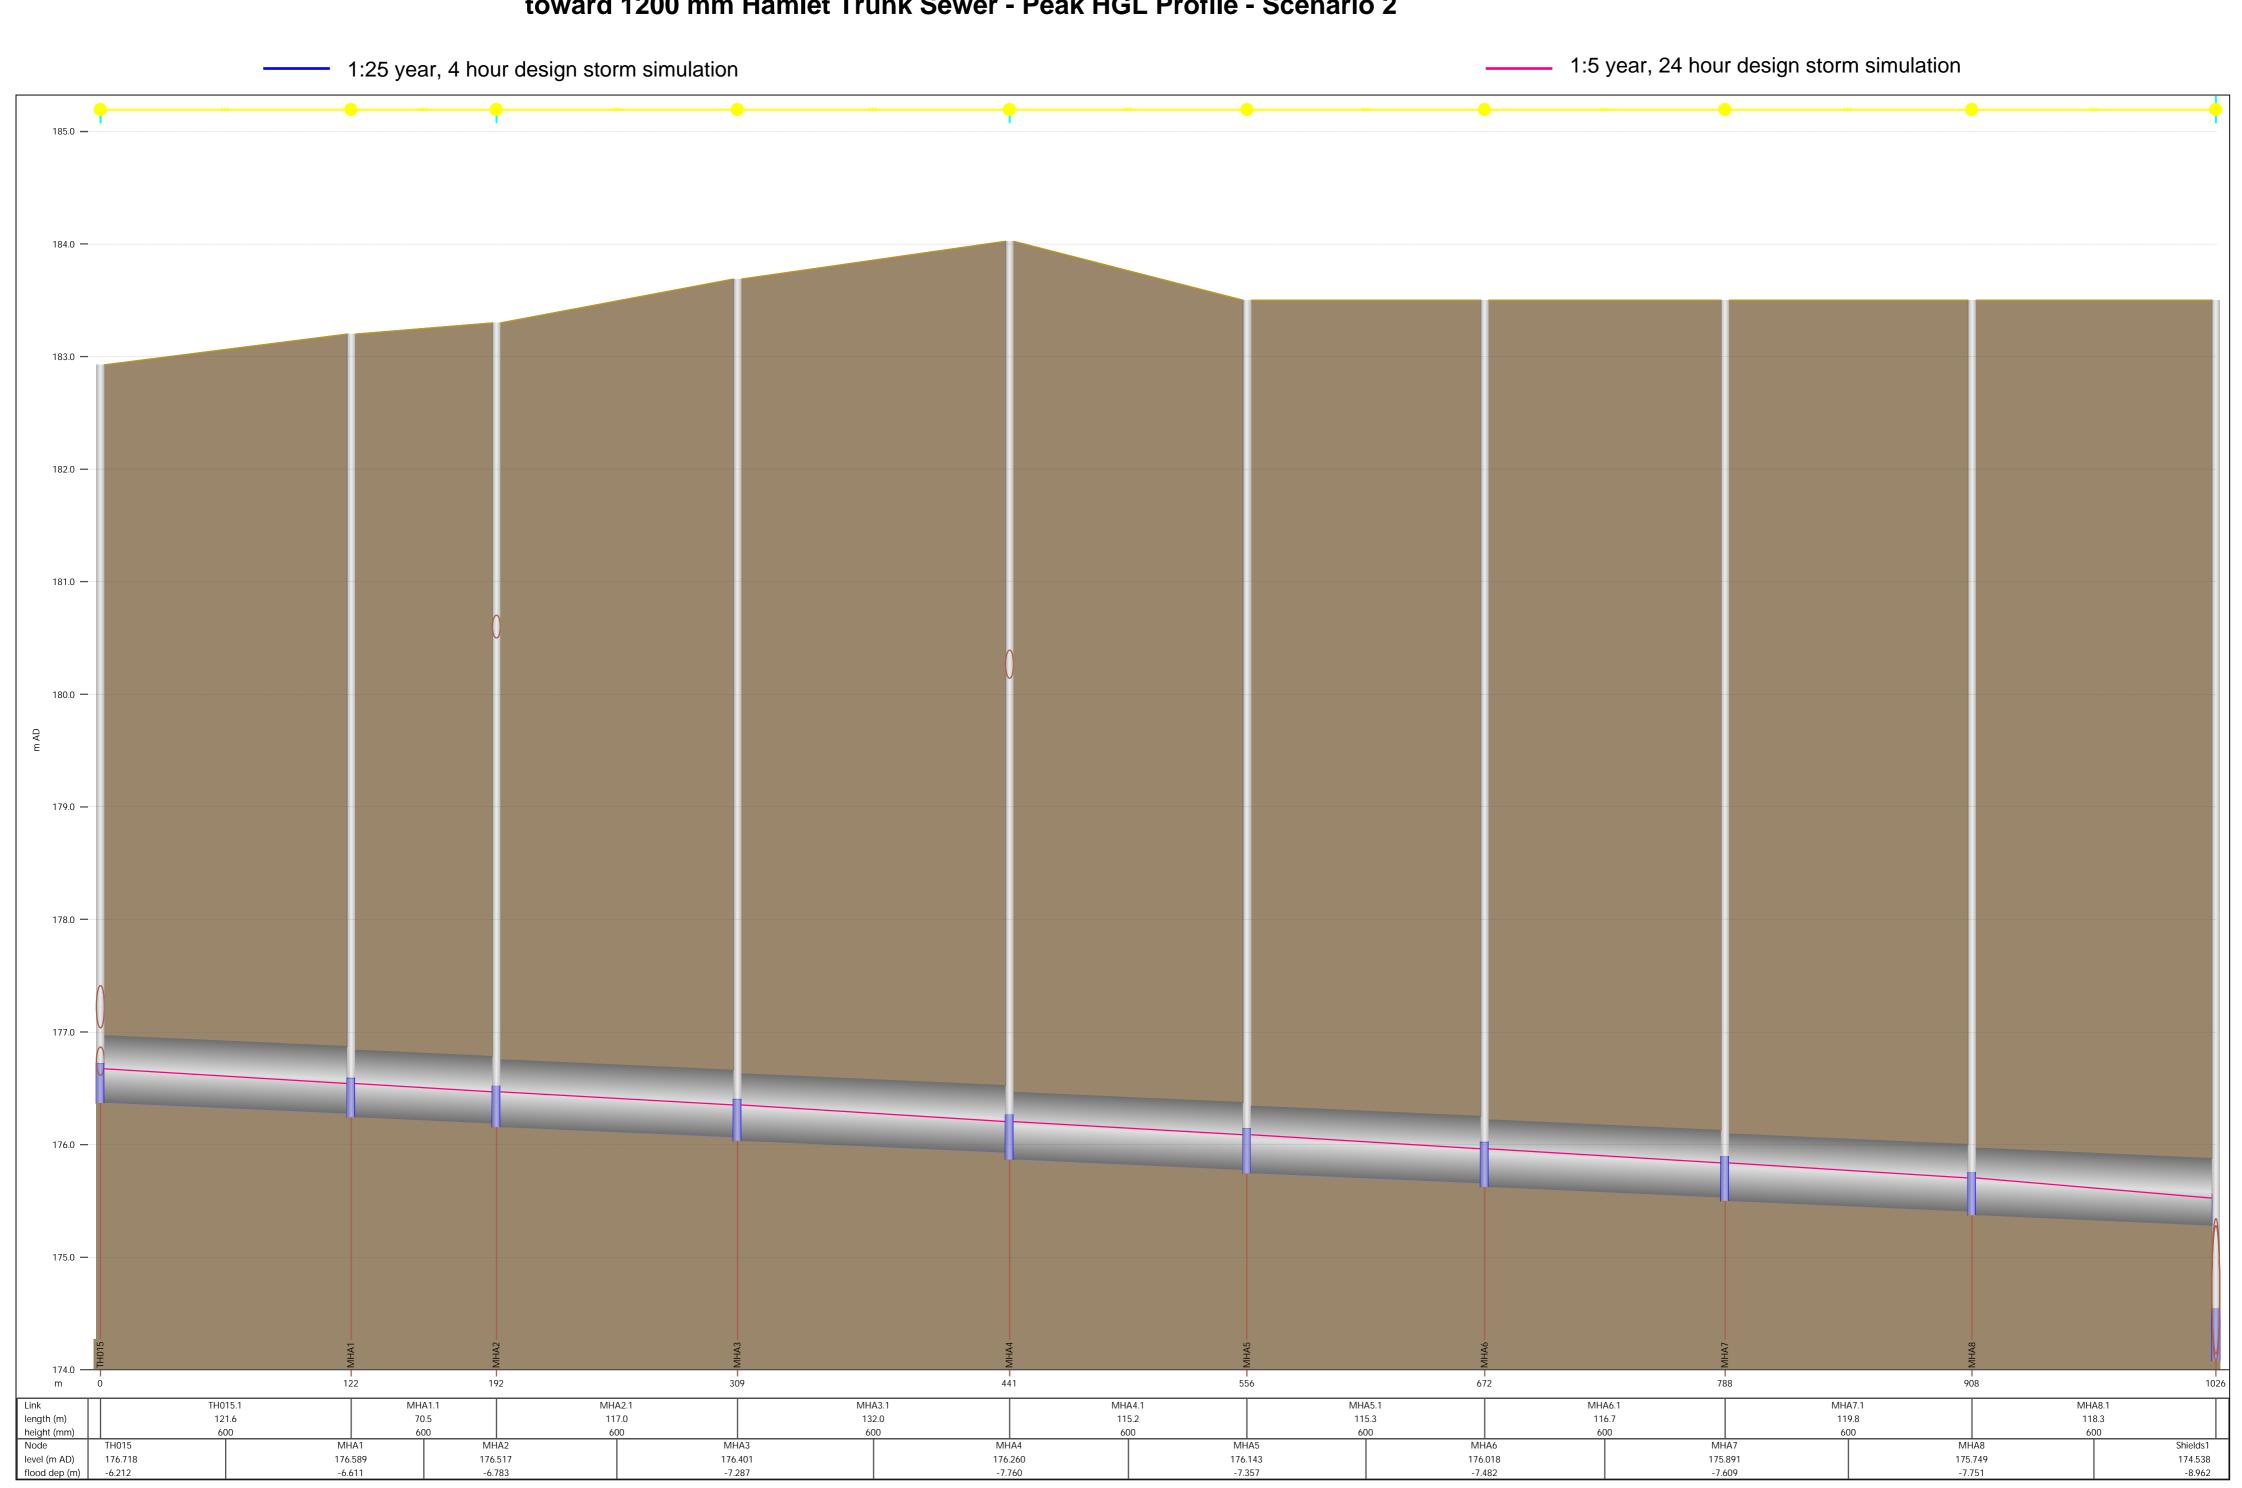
St Alphonse and Shields Street Trunk Sanitary Sewer from Pump Station in CR42 Road toward 1200 mm Hamlet Trunk Sewer - Peak HGL Profile - Scenario 2
